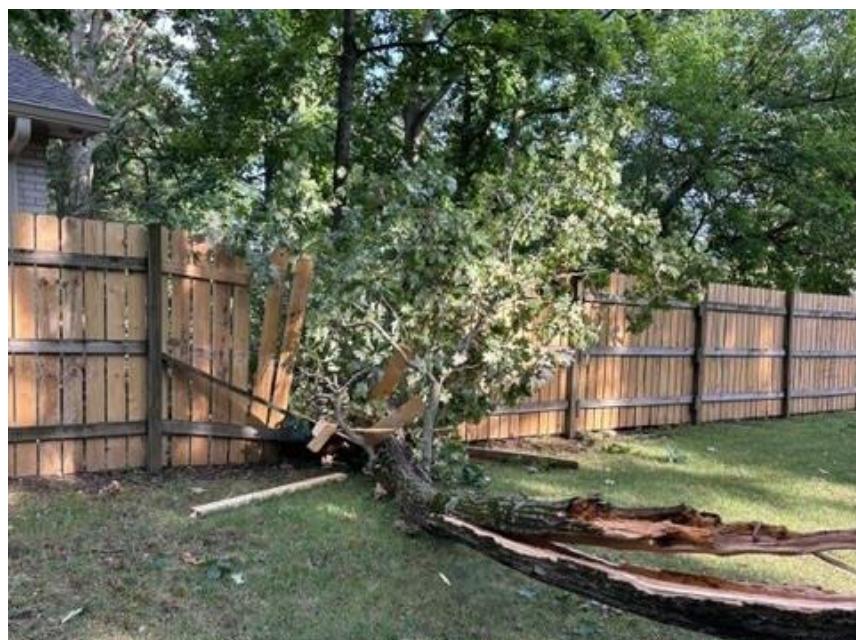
Damage to Fence, September 2025 (provided by applicant)
